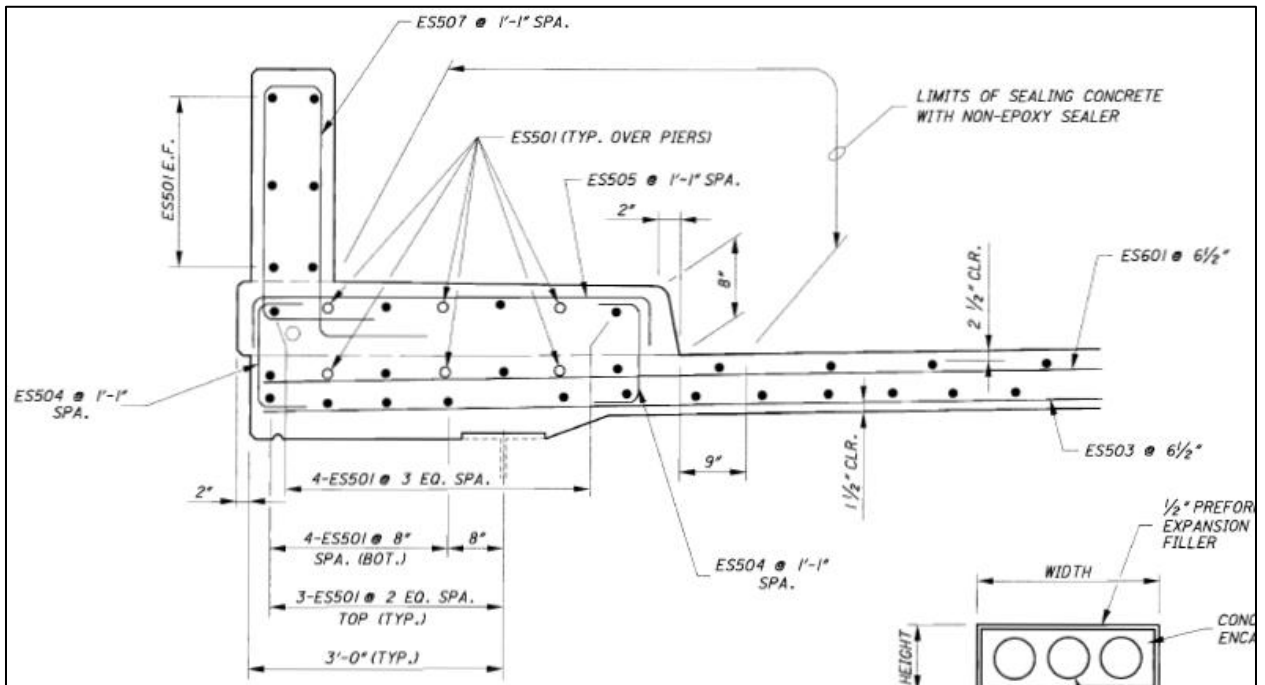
Canterbury Road Construction Plans, Parapet Cross Section
